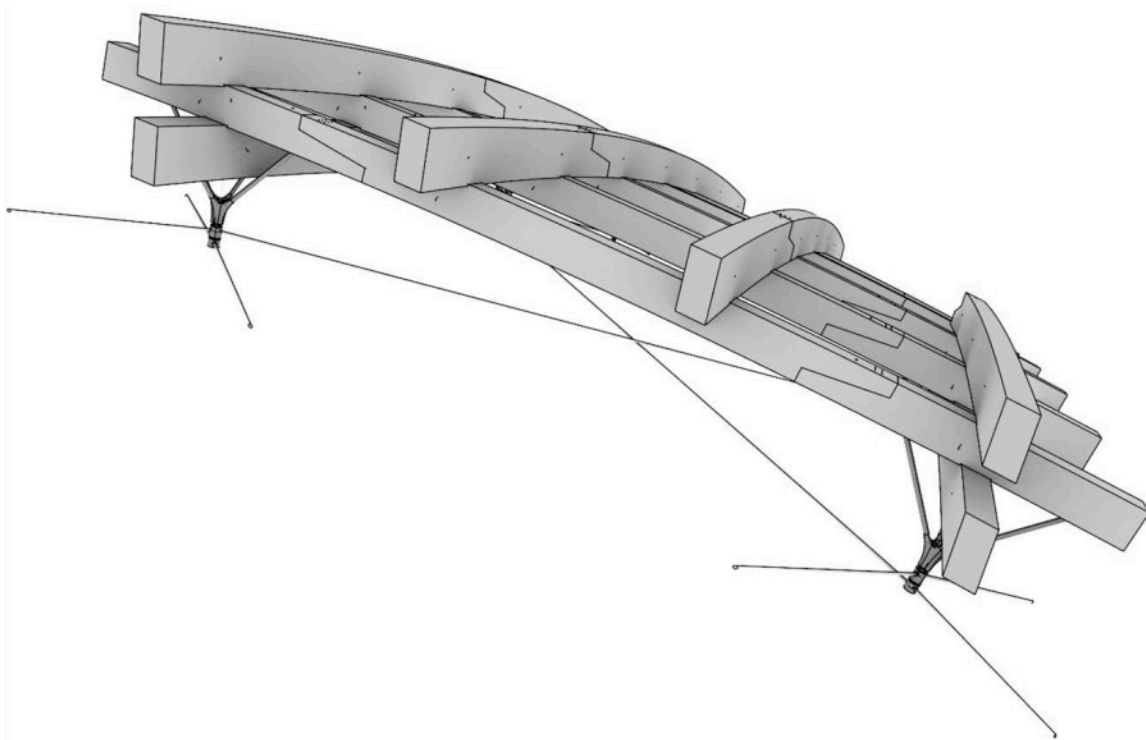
Typical gridshell cross section showing the three layers of the large dome
